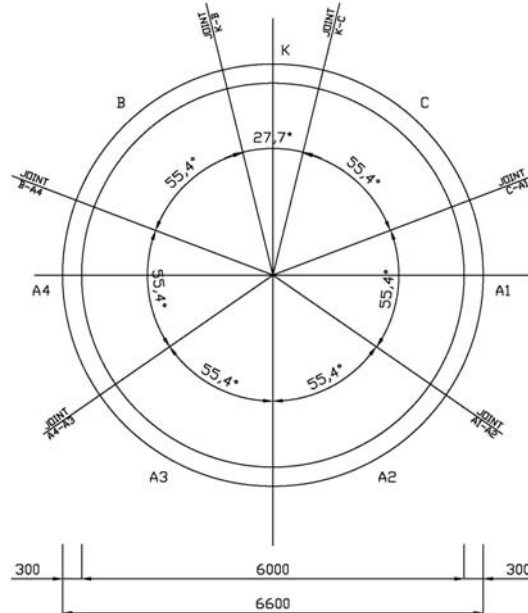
Main measures (in m) of the transversal section of the Terrassa Tunnel.
